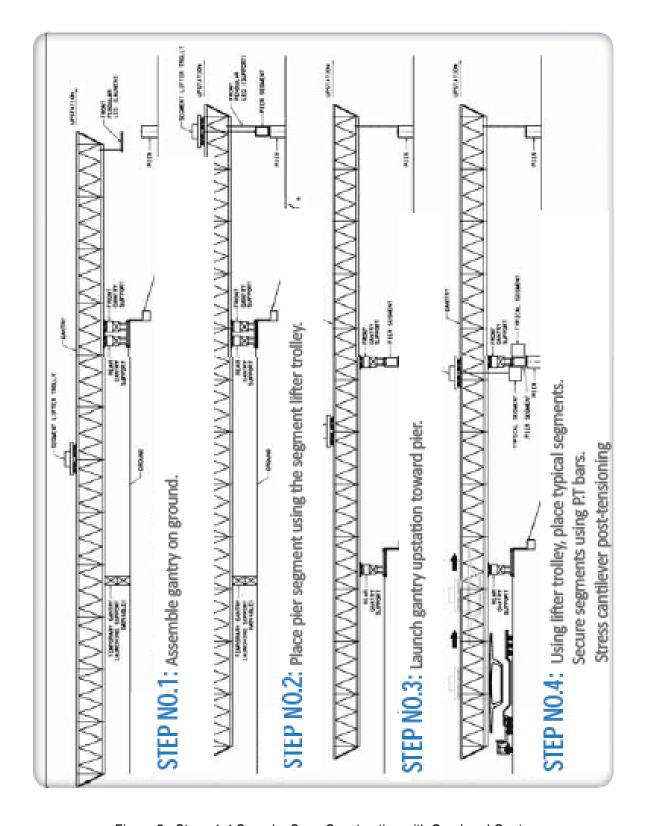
Steps 1-4 Span-by-Span Construction with Overhead Gantry
